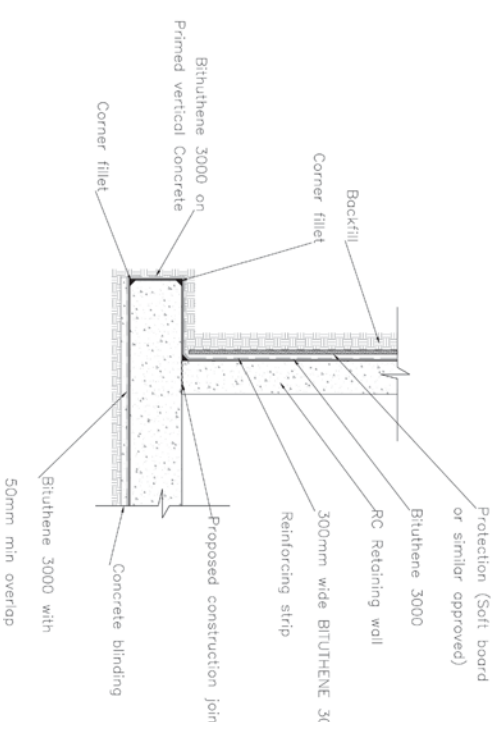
Homogenous retaining wall waterproofing detail
